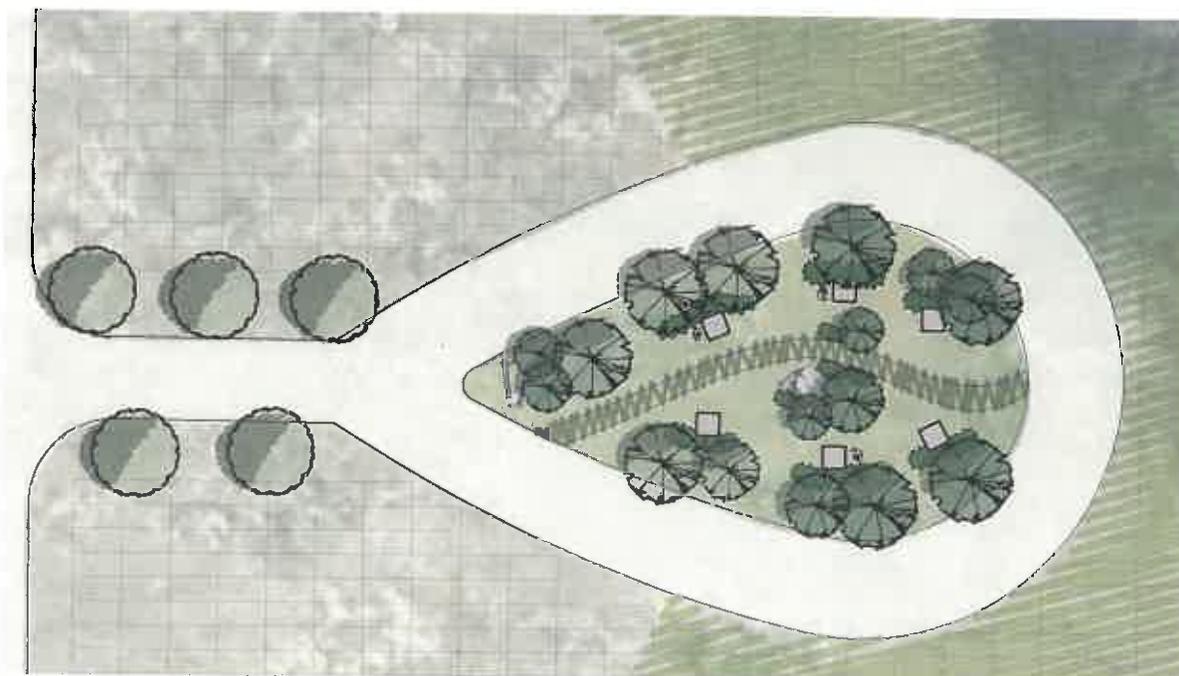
New Development Area Amenity Space Schematic Plan, Not to Scale
